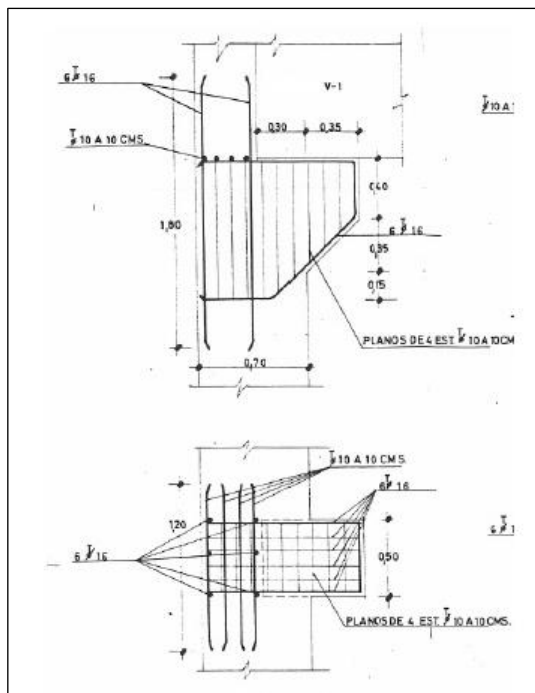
First Basement Corbel where beam V1 rests on. Source: (SIGMA & Servicios de Ingeniería, 2016)
